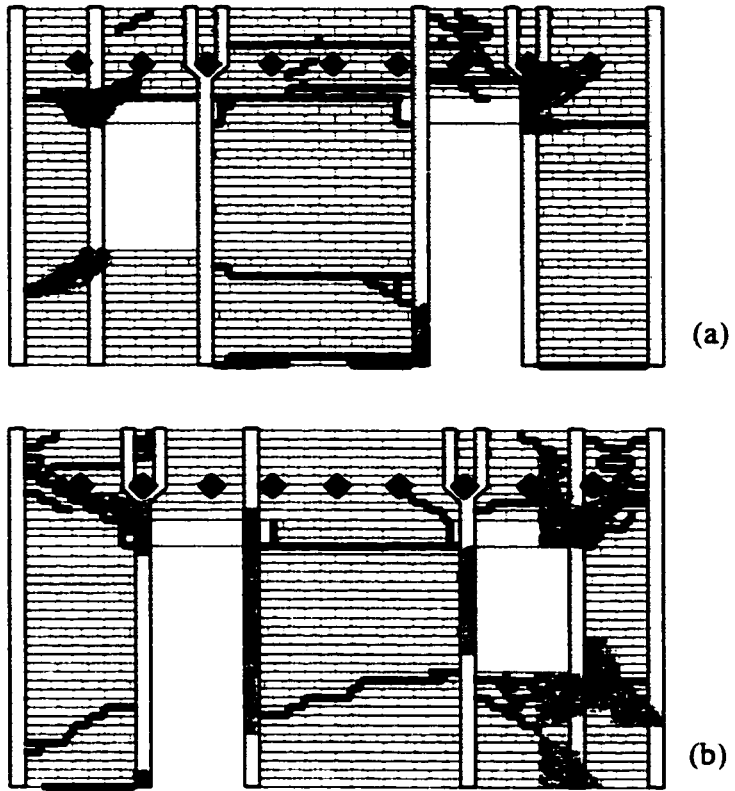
Crack pattern on repaired shear wall after La Malbaie x 4.0: (a) West wall; (b) East wall. (Shaded area indicates Tyfo material de-bonded).
